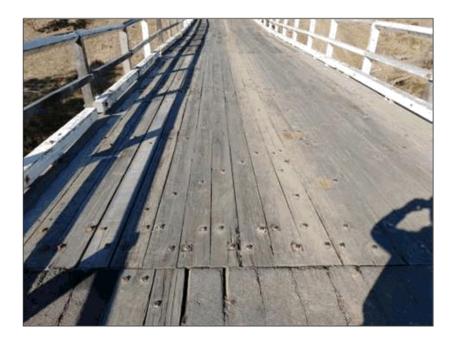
View of the Delegate River Bridge deck looking north. The deck of the structure comprises of a longitudinal running deck constructed from individual planks that are supported by transverse planks. Vertical fasteners have been used to secure the deck and kerb through the girders. Vertical fasteners increase the rate of decay in timber as they allow moisture to travel down the fastener into the heartwood of the girders and corbels, therefore increasing the moisture content in the middle of these elements. The heartwood of a log element is less capable of breathing and expelling moisture than the sapwood that surrounds and once the moisture content exceeds 22%, timber consuming fungi are activated and the decay process begins.
